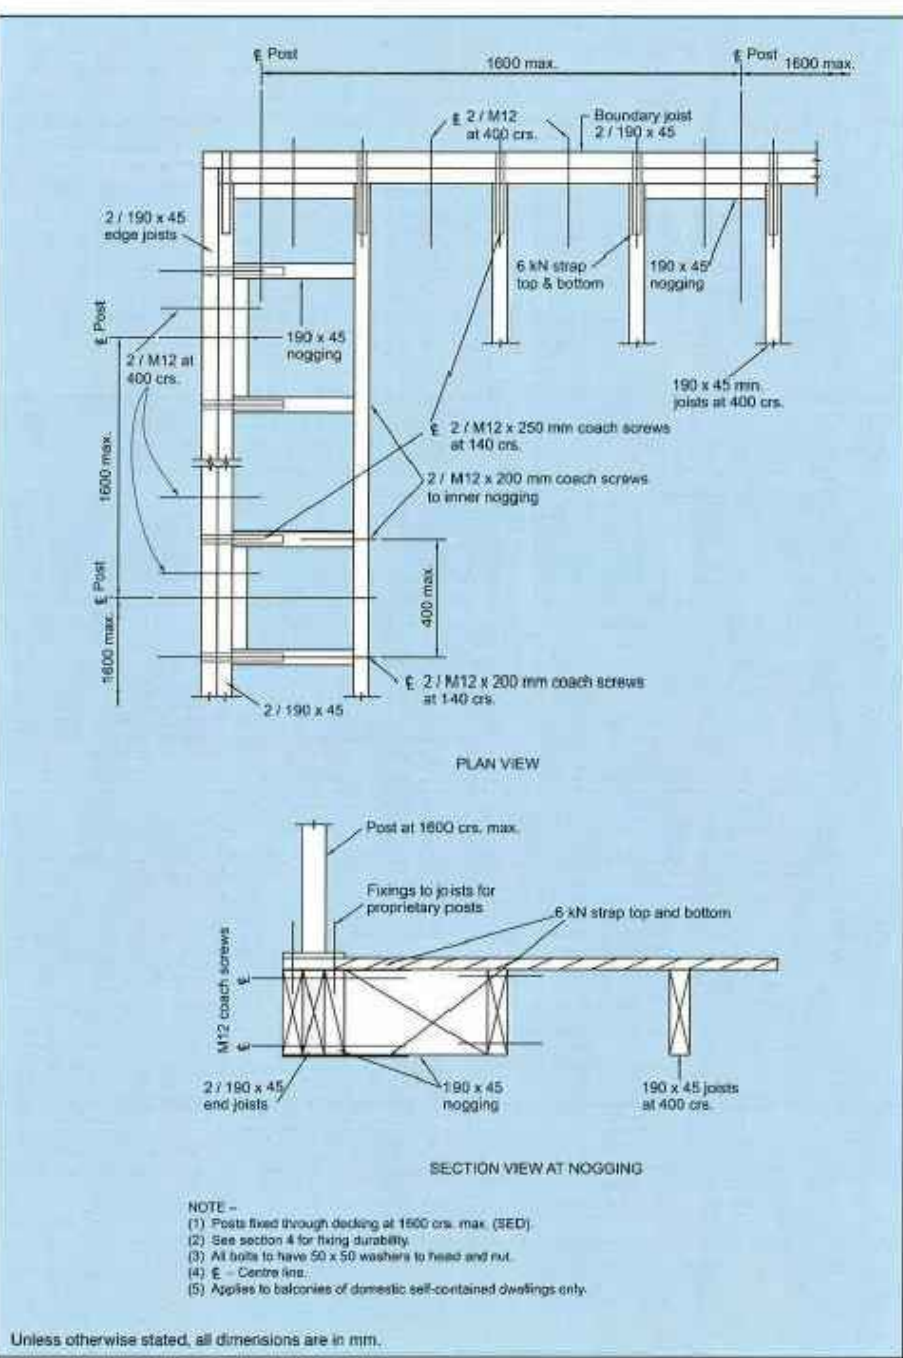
(b) – Top-fixed post support detail for cantilever balustrade (see 7.4.1.3)
